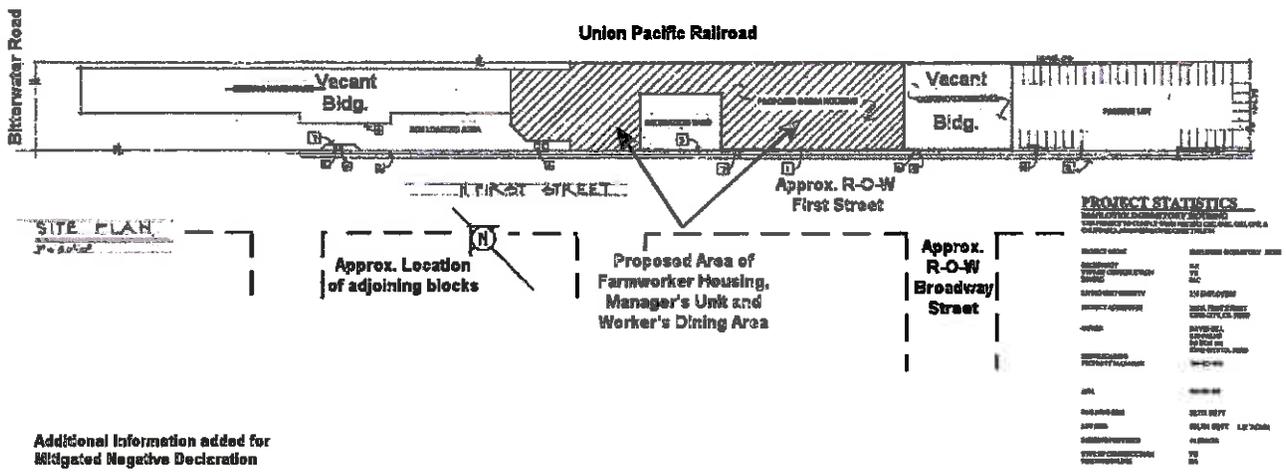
Initial Plot Plan of Farmworker Housing with added information, 218 N. First Street
